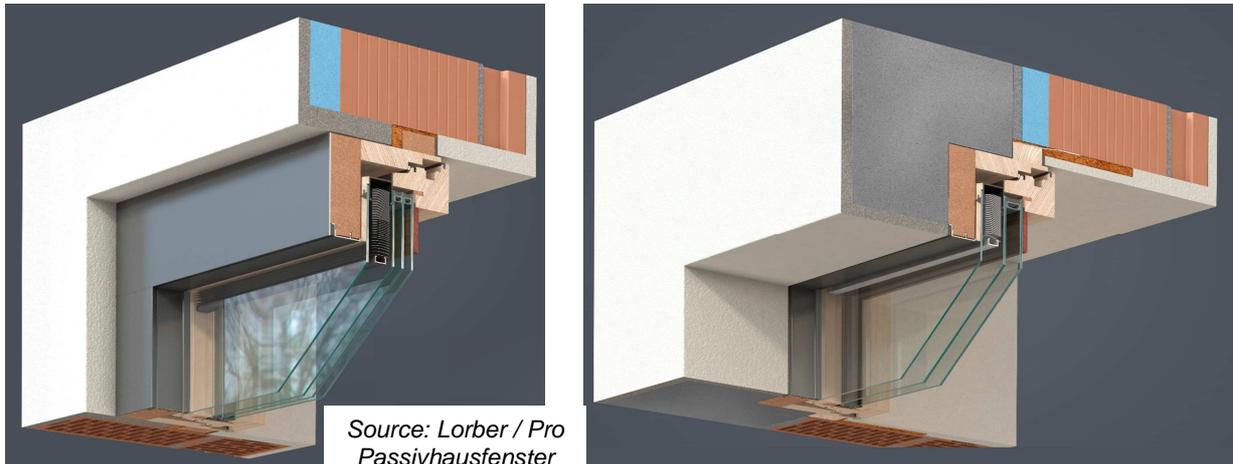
Window installation in existing wall, with insulated jamb panel.
